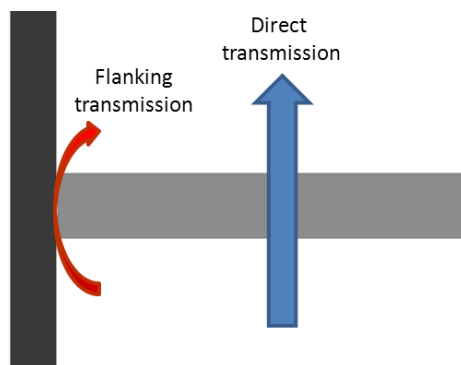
Flanking transmission between a built-up wall and a floor slab
